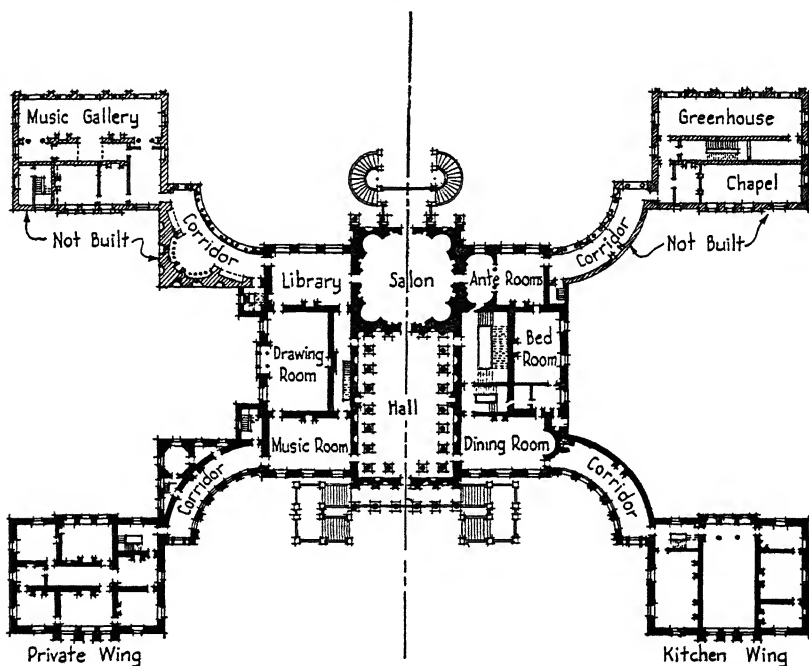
PLAN, KEDLESTON HALL, DERBYSHIRE (1761-65)
